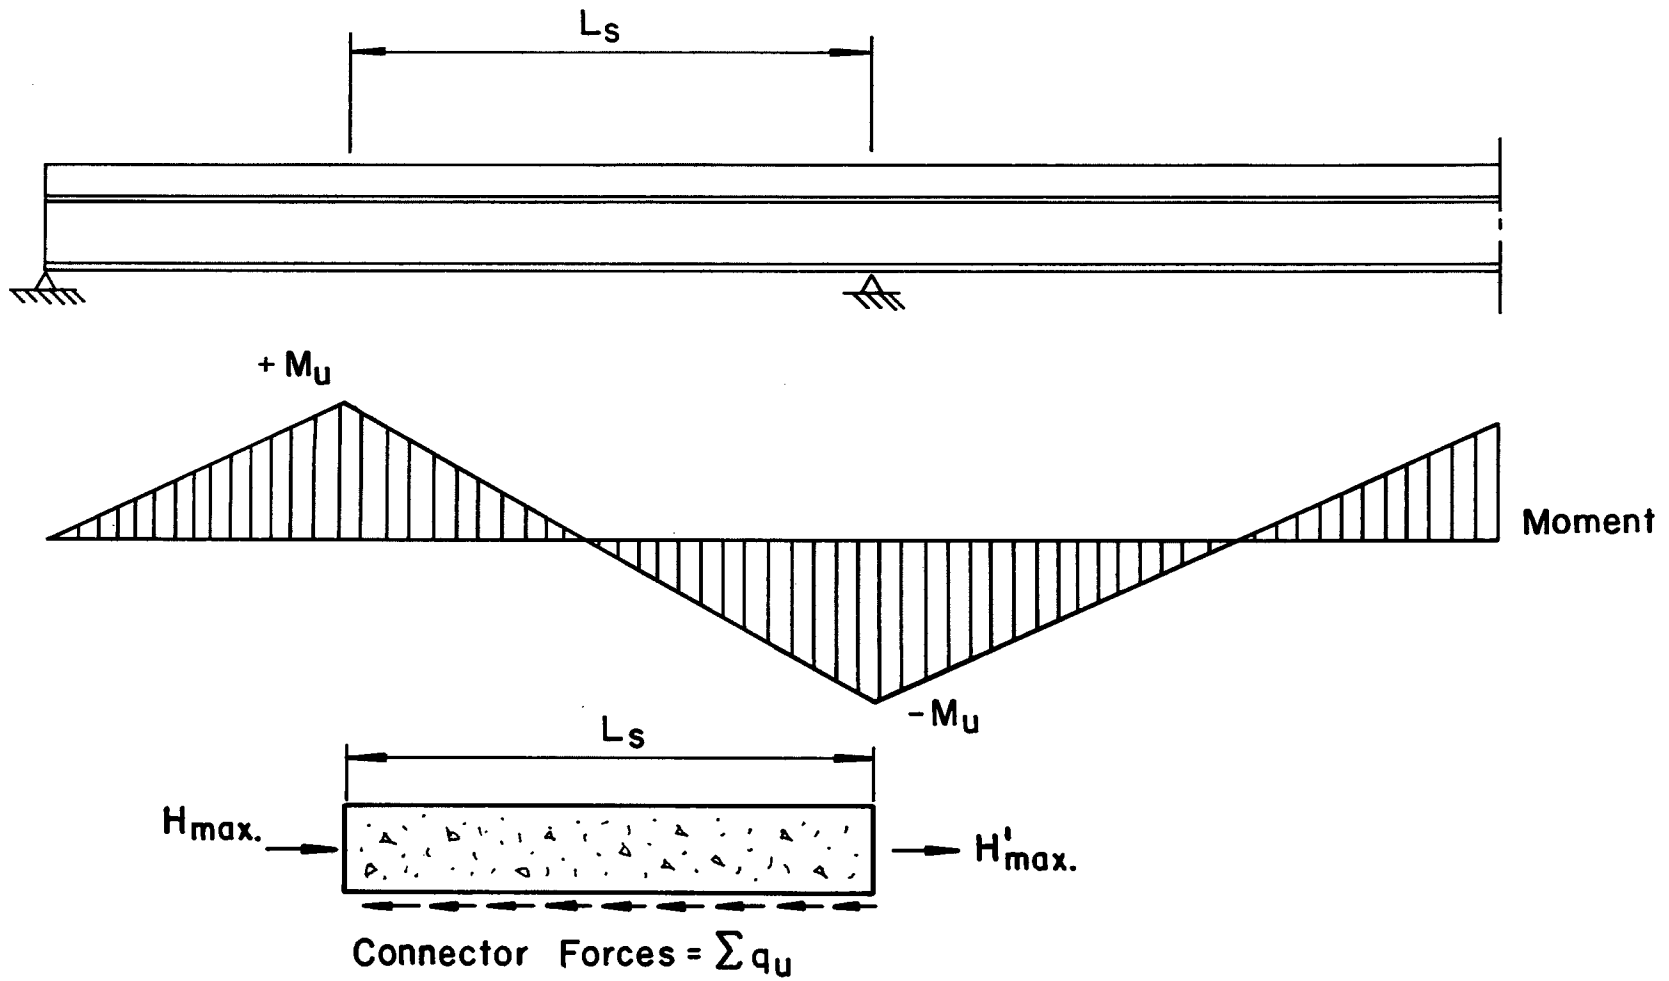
SHEAR CONNECTOR FORCES AT ULTIMATE LOAD FOR A CONTINUOUS BEAM
